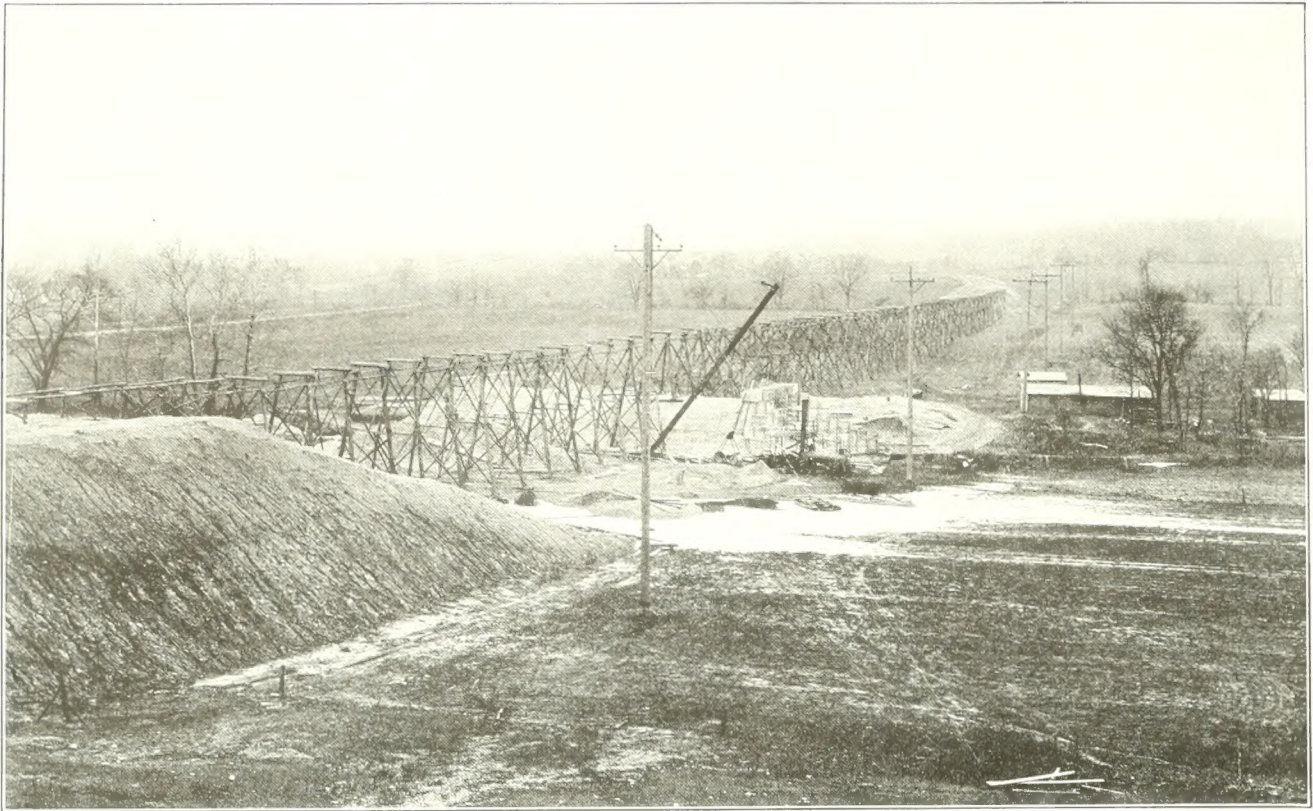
CONSTRUCTION TRESTLE FOR THE FILL AT PICAYUNE CREEK, B. & O. R. R., JAN. 15, 1919
